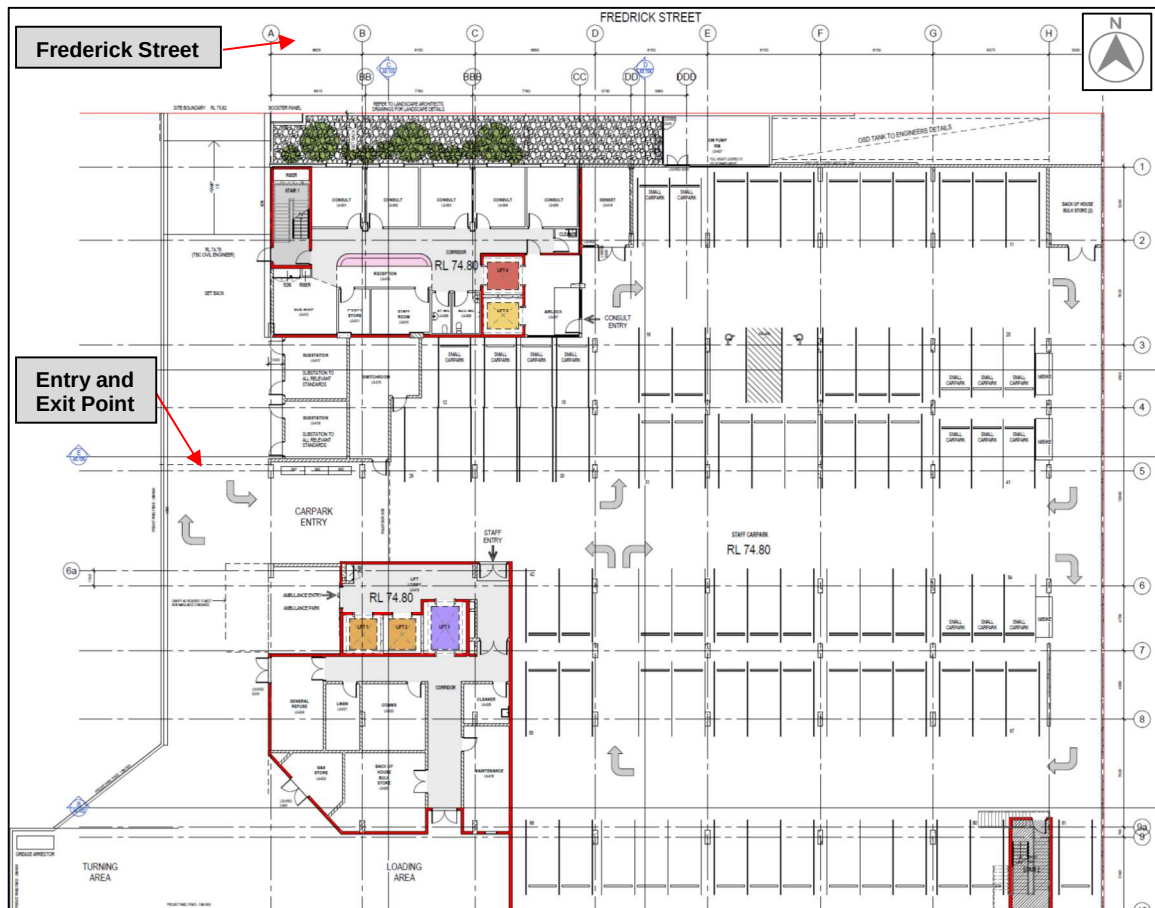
Proposed Ground Floor Car Parking Arrangement (source: EIS)
